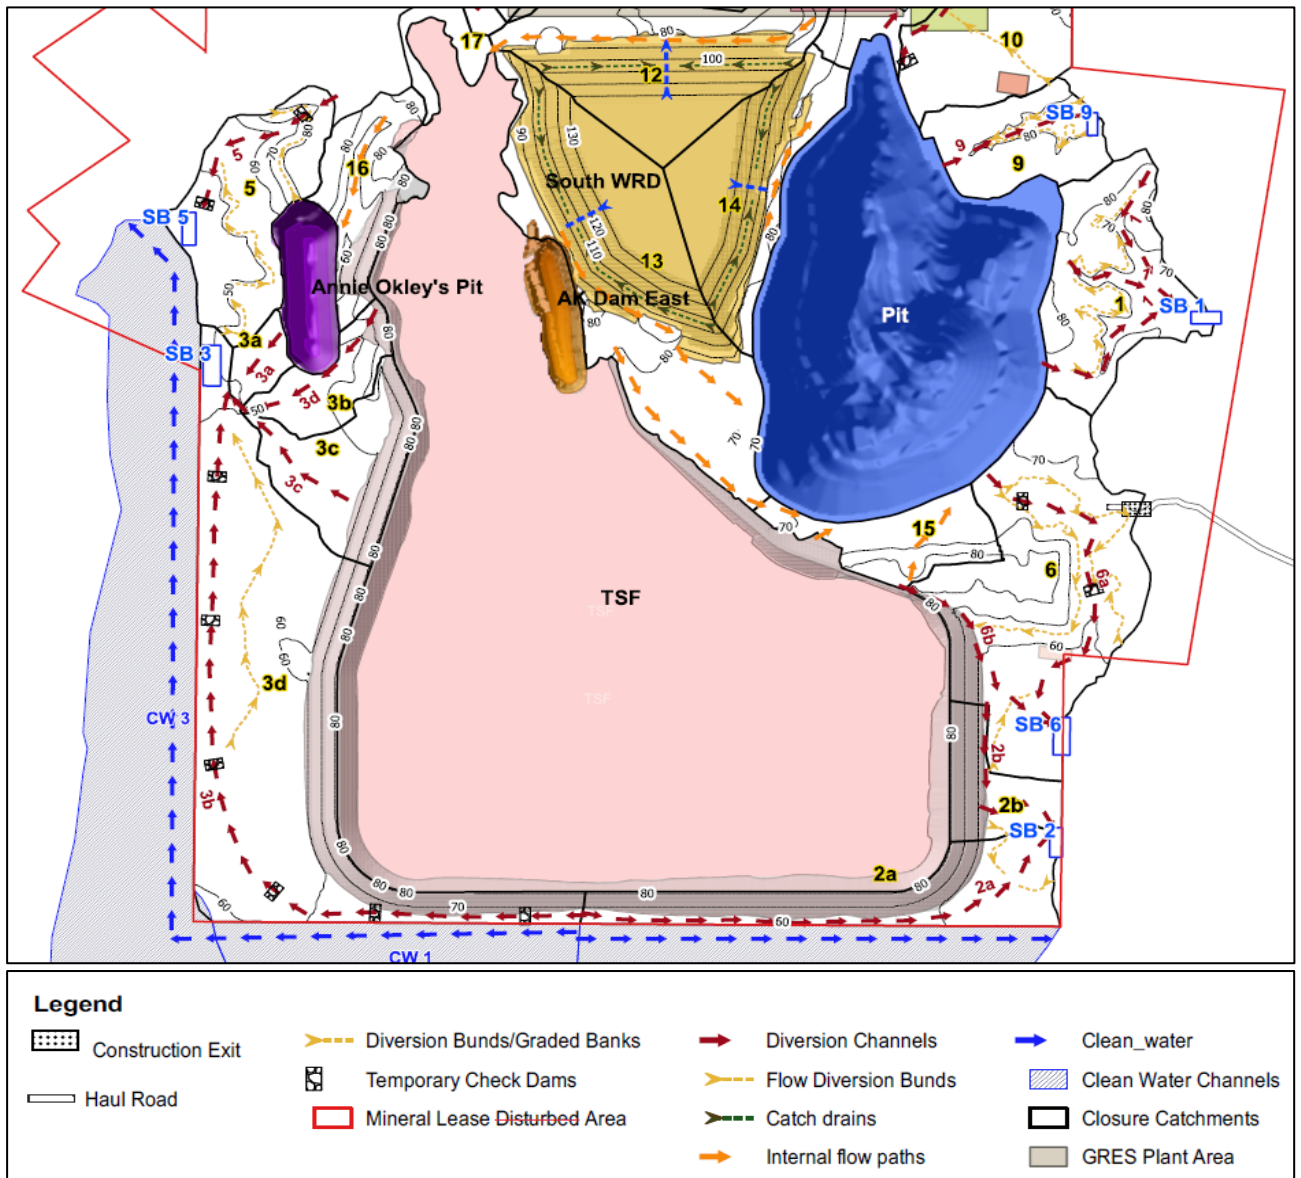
Tailings Storage Facility Drainage Arrangement
